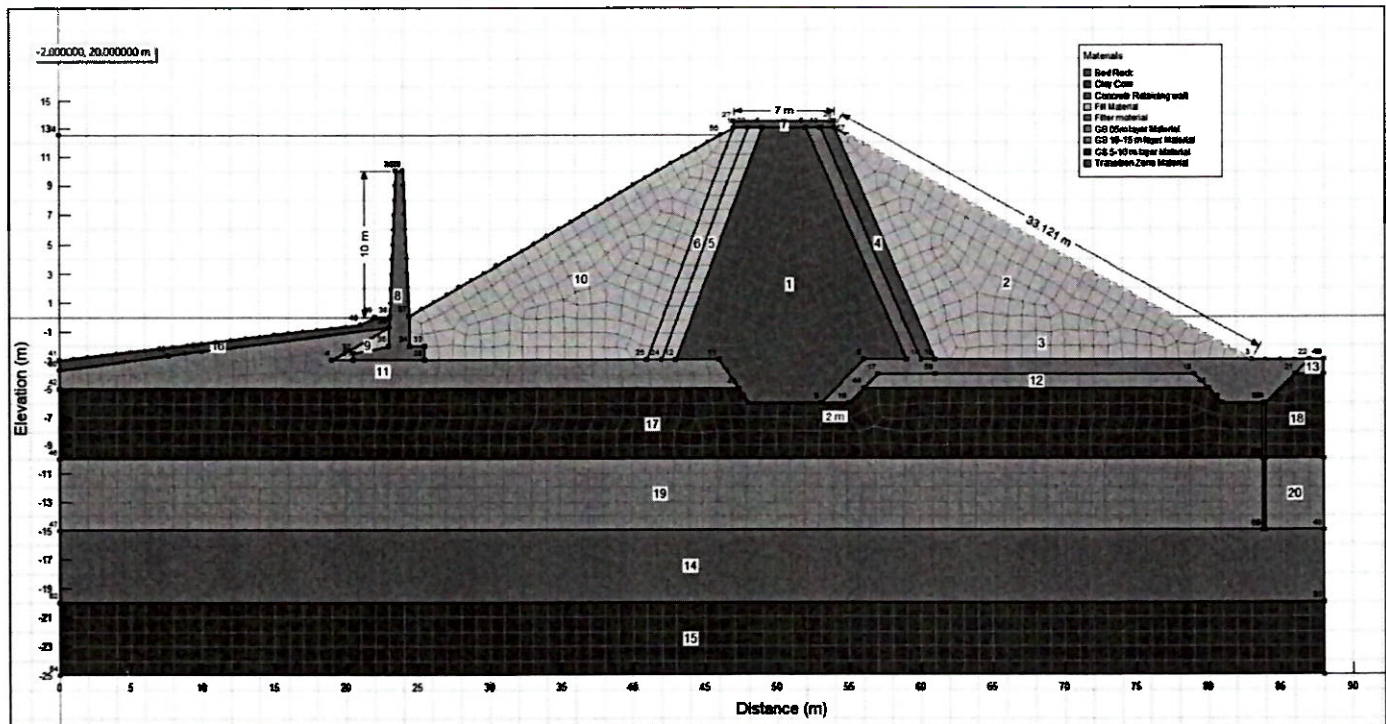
Existing RCC retaining wall type of saddle, new embankment type saddle dam cross-section, and various zones material, foundation soils (taken from Geotechnical report), drainage well, and with upstream clay blanket (1.0 m thick) to prevent seepages
